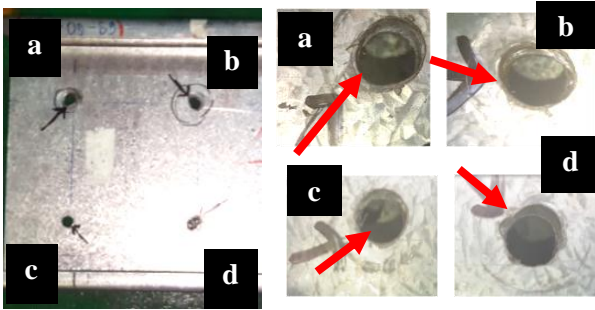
Beam bolt holes failure (RG-BGJ-1)
